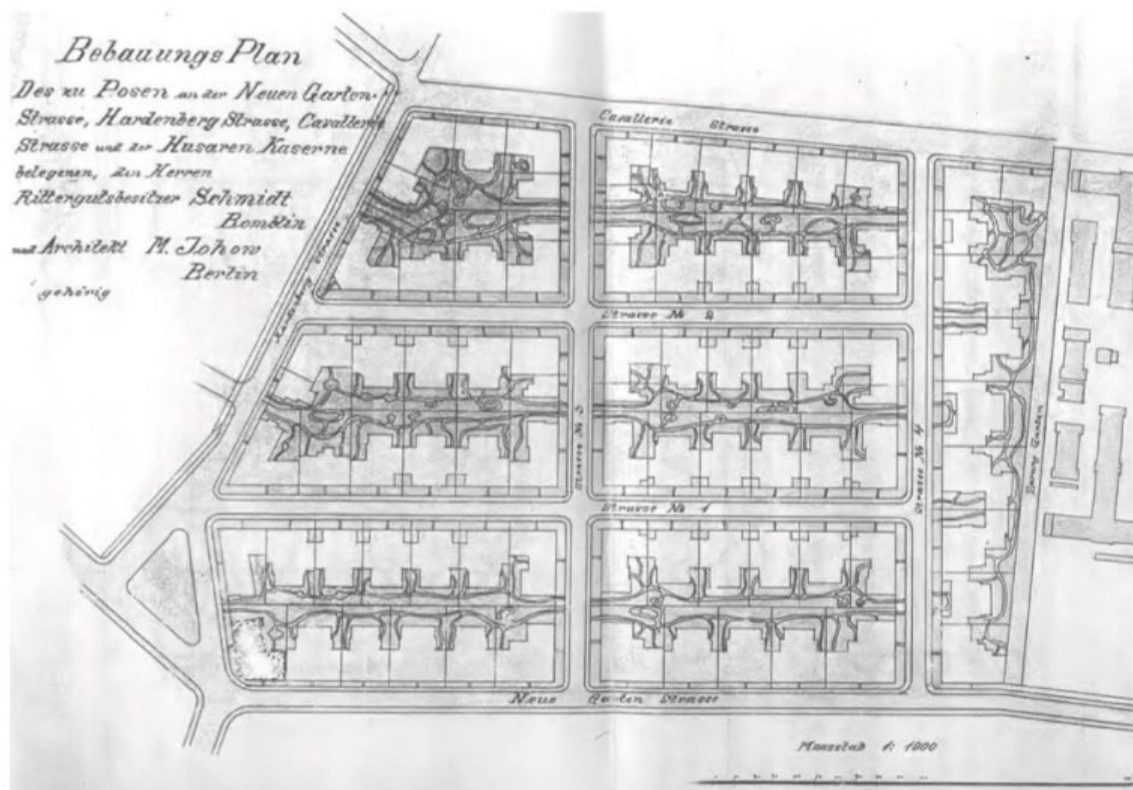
Max Johow, construction projects of the district with gardens inside the quarters, front gardens and a reformist design of tenement houses, 1902 (source:
